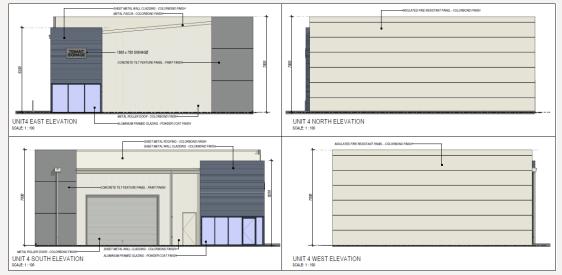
| Unit 4 elevations (Source: David Menz Building Design)
